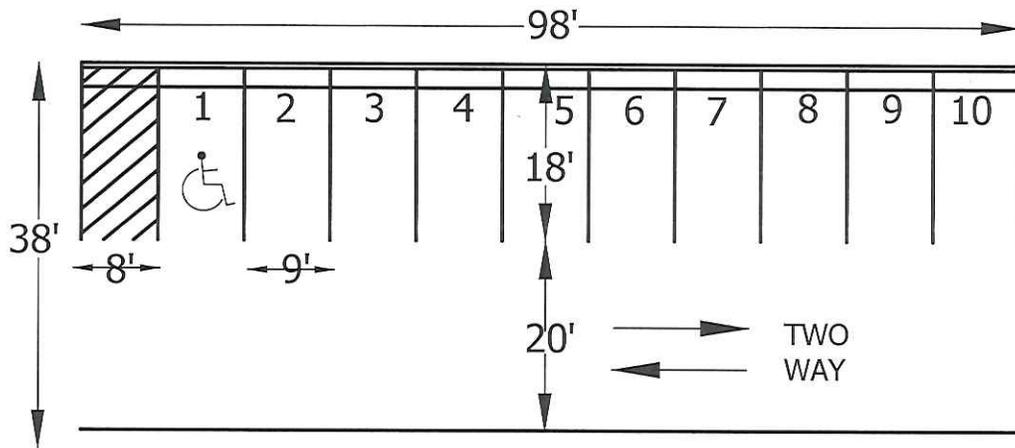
A parking lot with ten (10) 90-degree parking spaces if exempt from the Parking Lot Landscaping Requirements.
